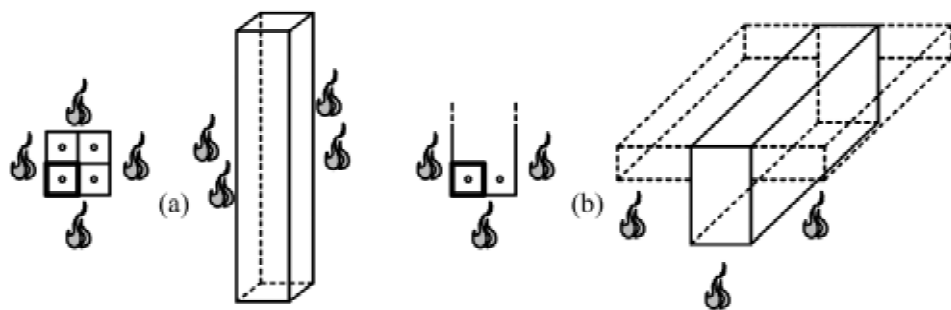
Typical sections of a R/C column (a); and of a R/C beam (b); the part enveloped by the thick black line is recreated in the specimens.
